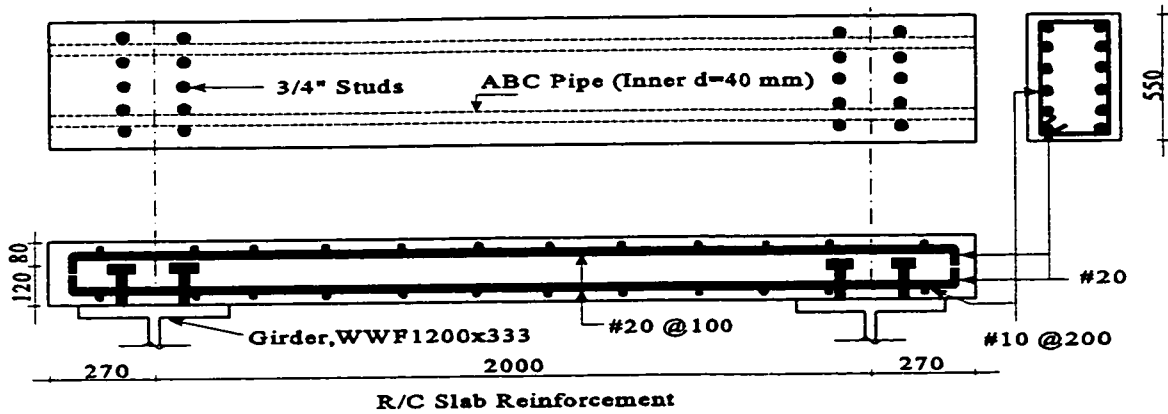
Deck slab reinforcement for the designed specimens.
